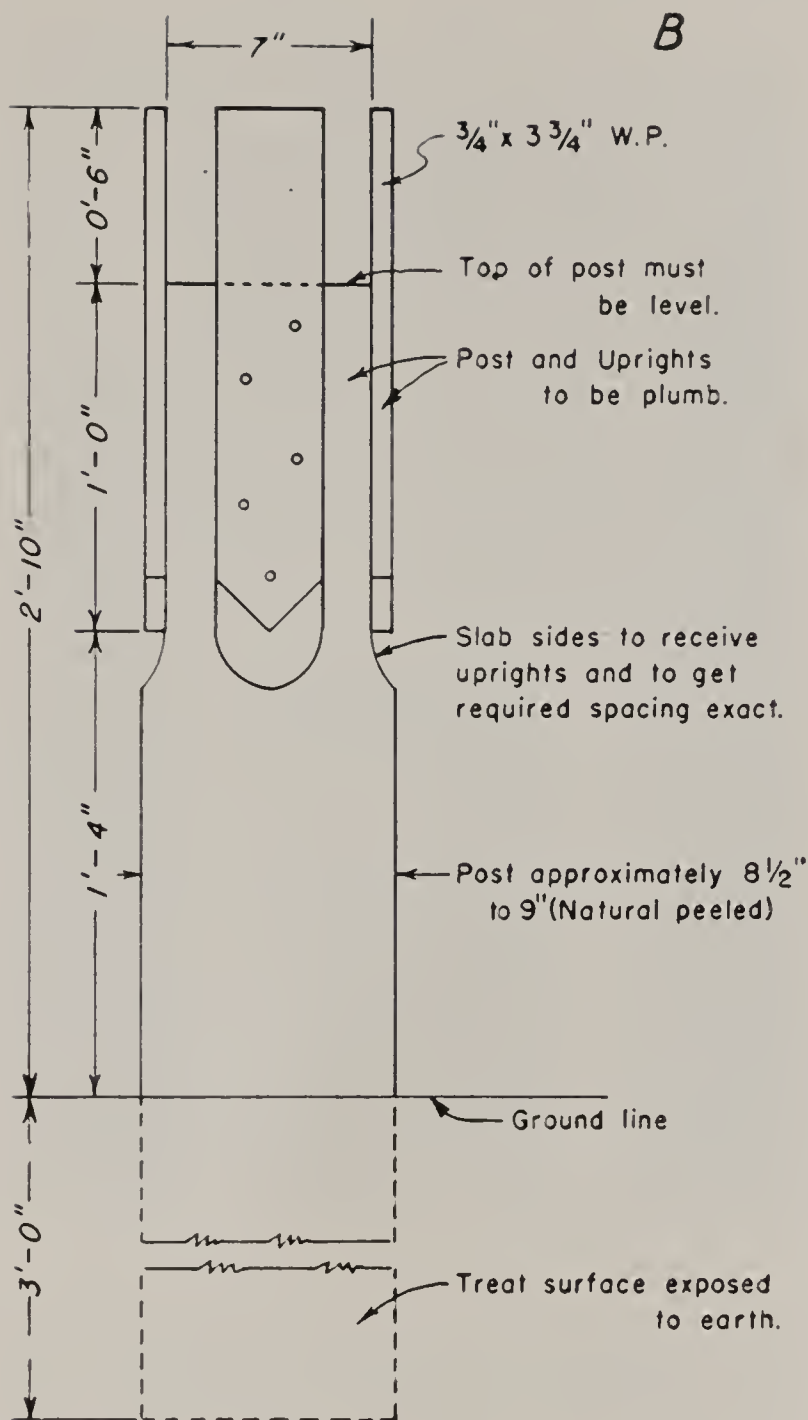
Plans for constructing Forest Service type rain-gage support.
